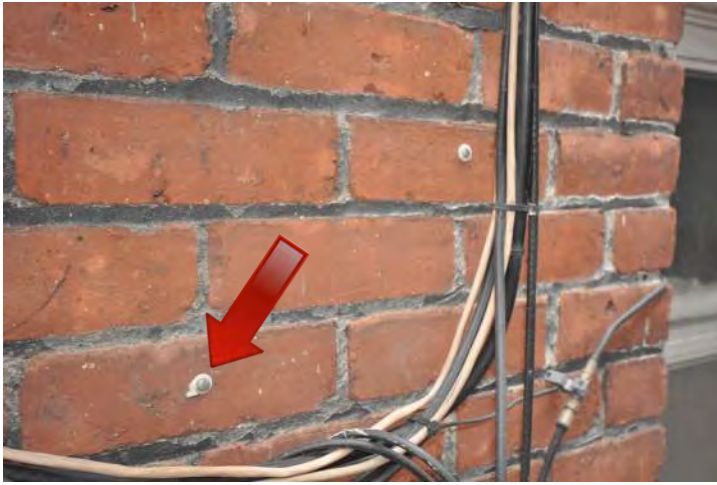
Masonry detail at the south elevation of the library. Telephone and data cabling is observed anchored into the wall system. Previously used anchors have not been removed, potentially leading to rust staining and rust jacking where ferrous anchors corrode. All unused anchors should be removed to prevent damage to the brick. Future anchors should be installed in mortar joints wherever possible because they are considered sacrificial and replaceable material.
